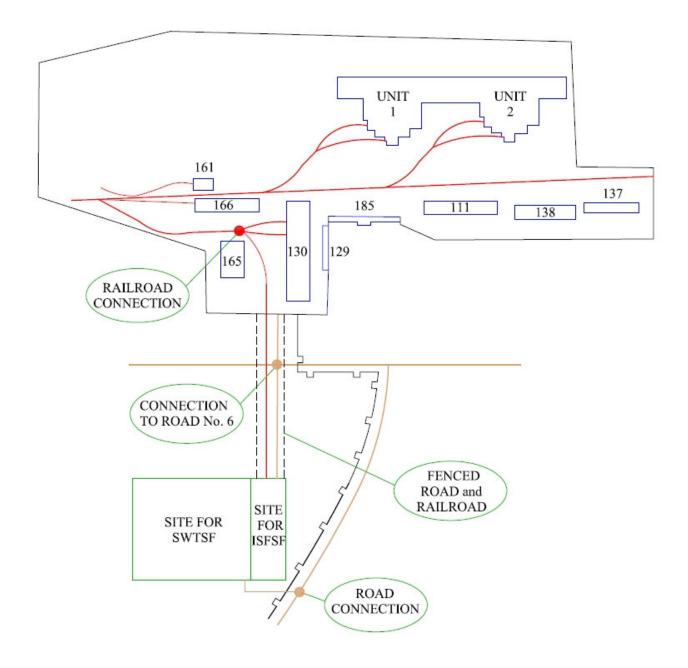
Scheme of the railroad and road connections with the existing INPP infrastructure
